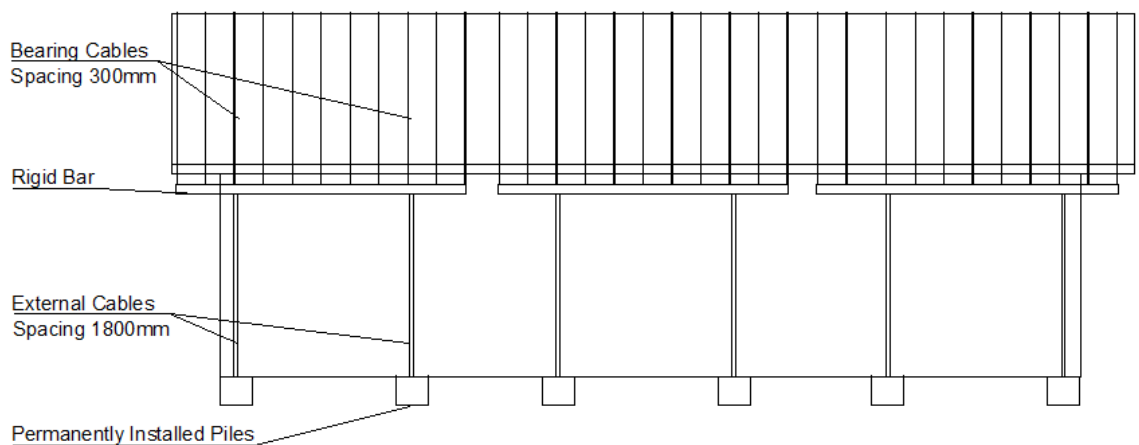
Elevation view of proposed retrofit system as applied to a gable-style roof
